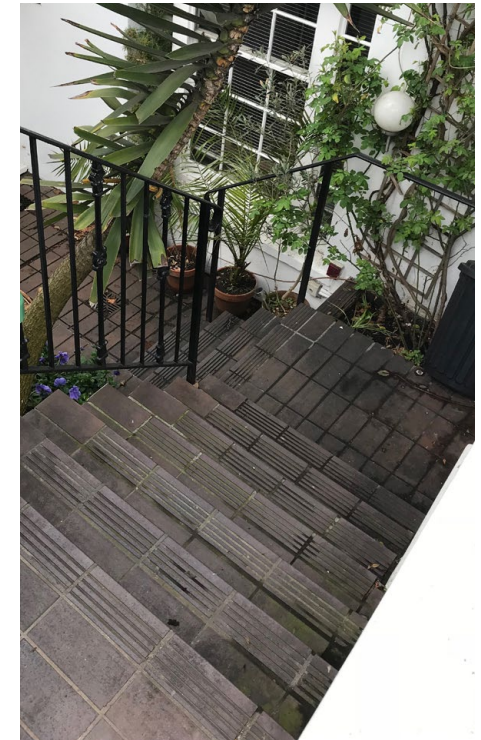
The staircase to 20 Regent's Park Road front area, with metal balustrades and railings
